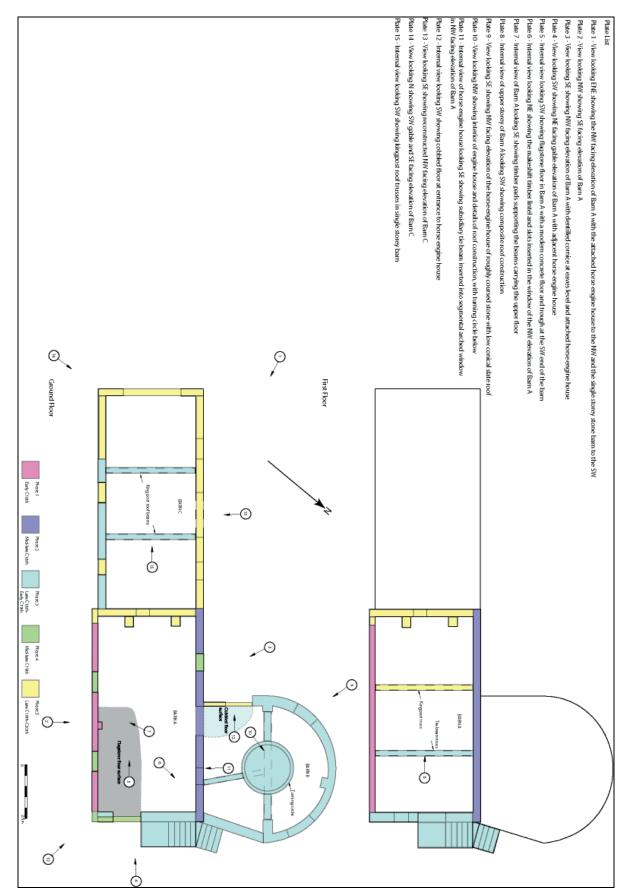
Phased plan of ground floor and upper floor of outbuildings at Pigeon House Farm
